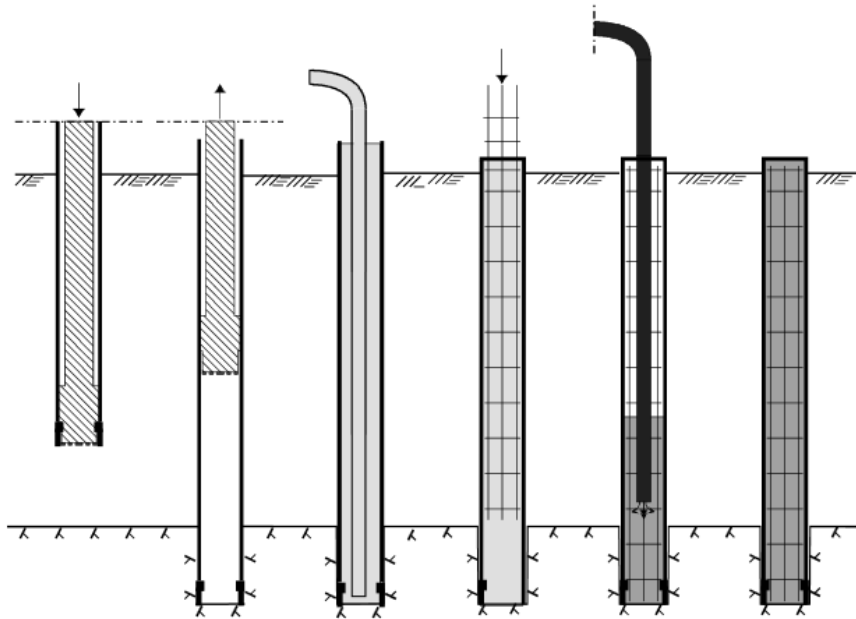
Drilled pipe pile with reinforcement. (TIEH 2000002E-03, 2003)
